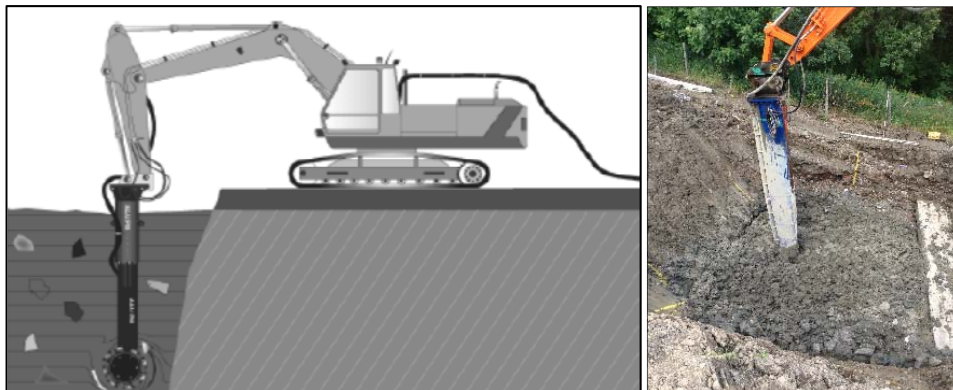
Illustration of Deep Soil Mixing Plant and photograph of cell construction
